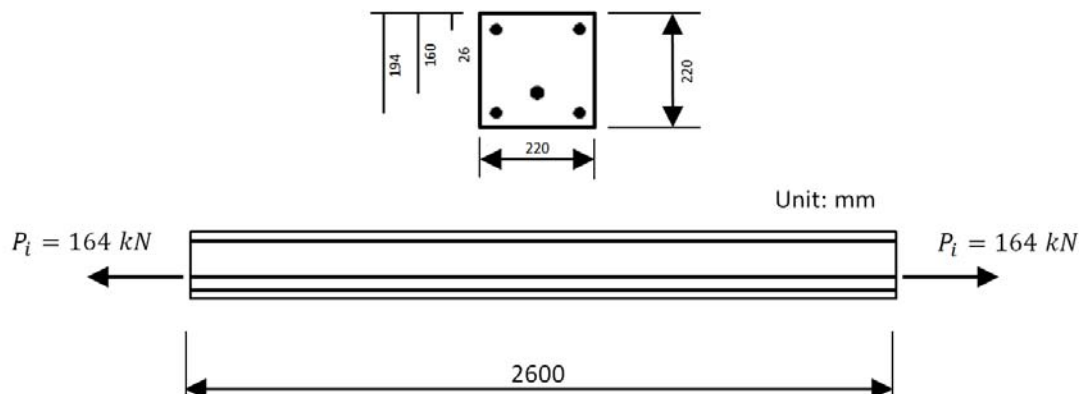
Beam geometry and reinforcement arrangement for Beam Case II and Beam Case III.
